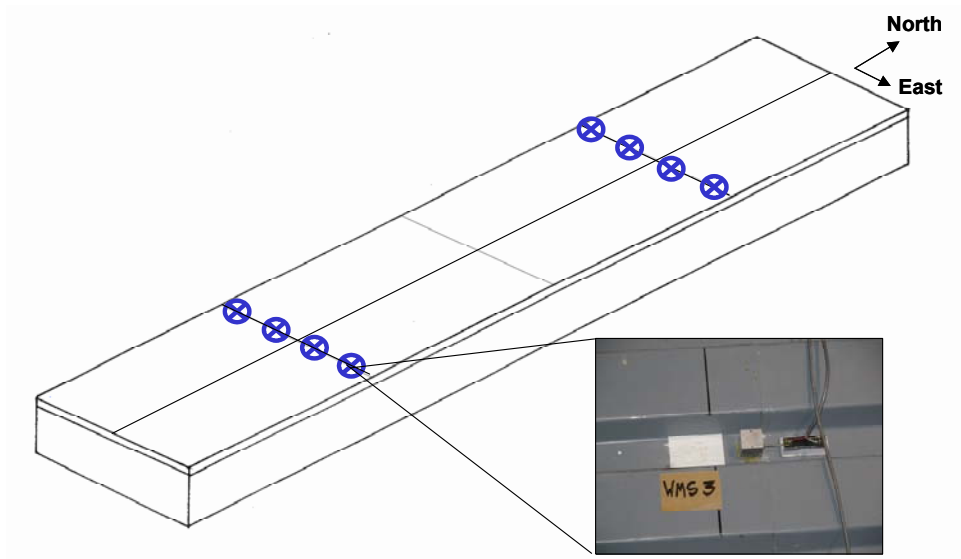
Instrumentation for measuring end-lap slip at puddle welds
